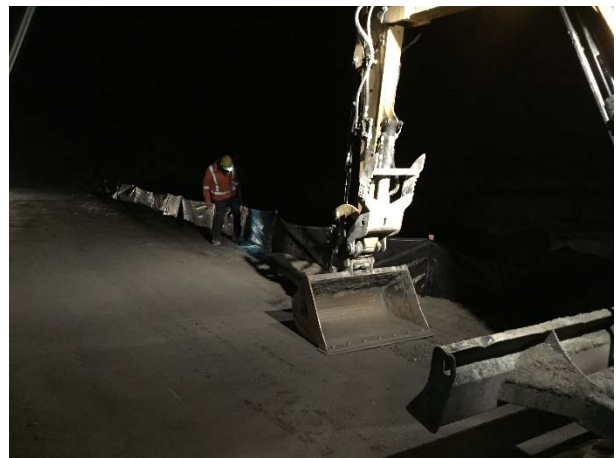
Silt fence installation between KM40.9 and KM41.2 of the Lillooet River FSR (March 28, 2016).
